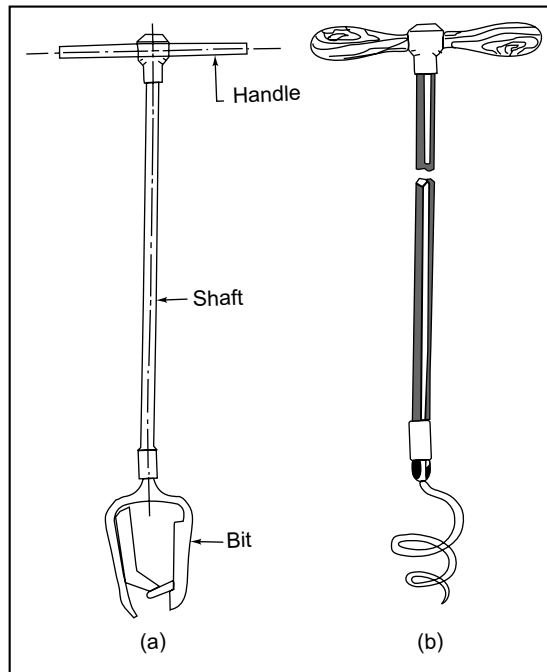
Hand boring equipment: (a) Hand auger, (b) Spiral
